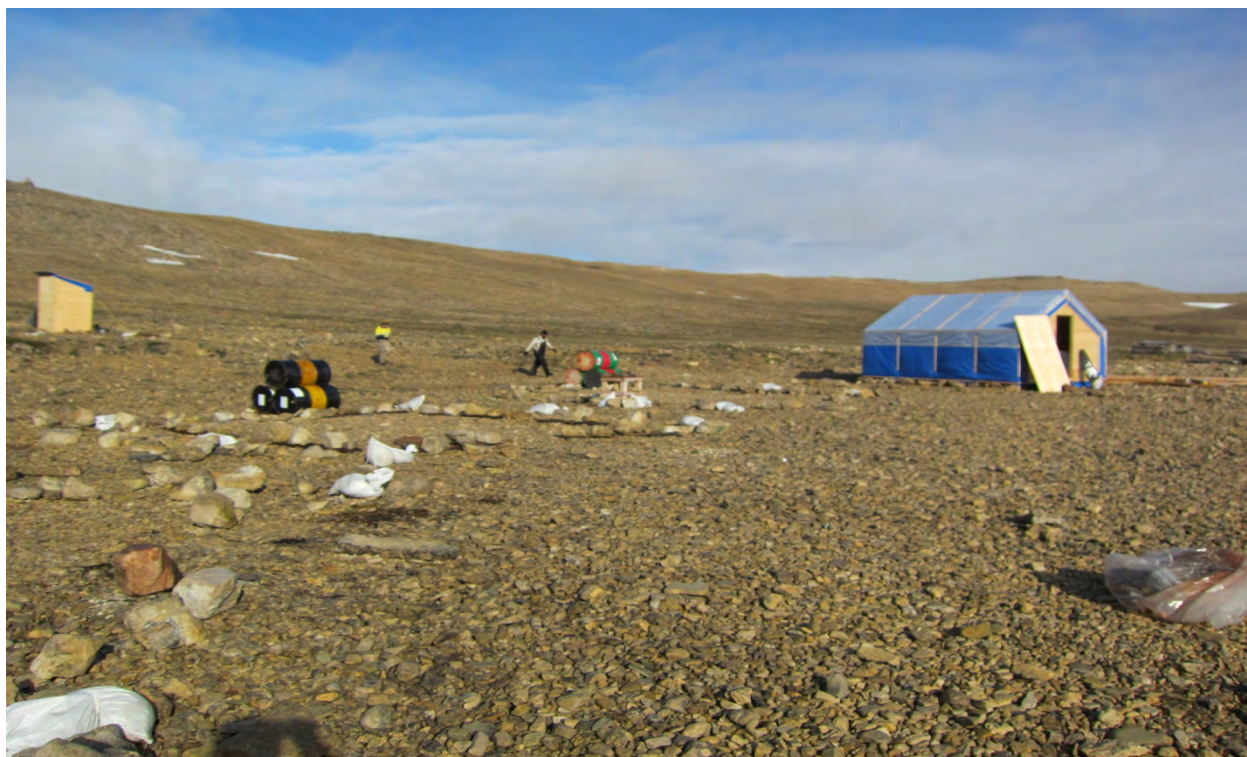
2014 constructed wood shack and outhouse, remain on site
